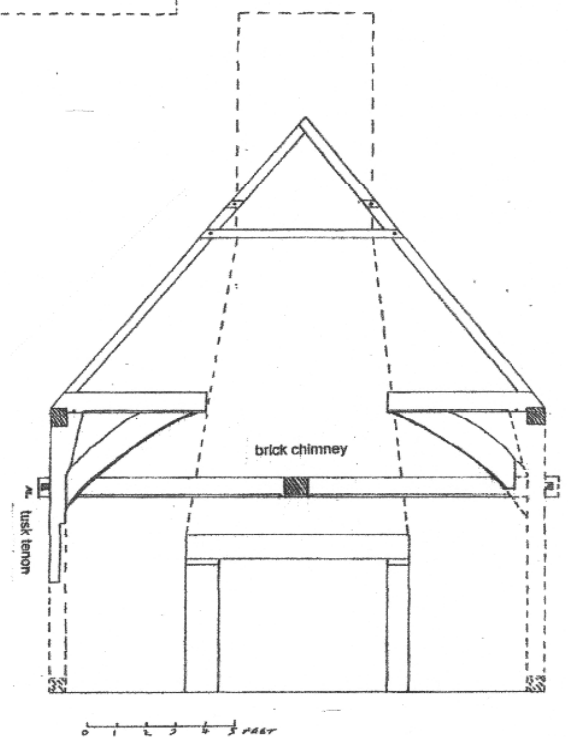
Butlers Farm, Wrabness, medieval hall house, central truss of hall and inserted brick chimney
